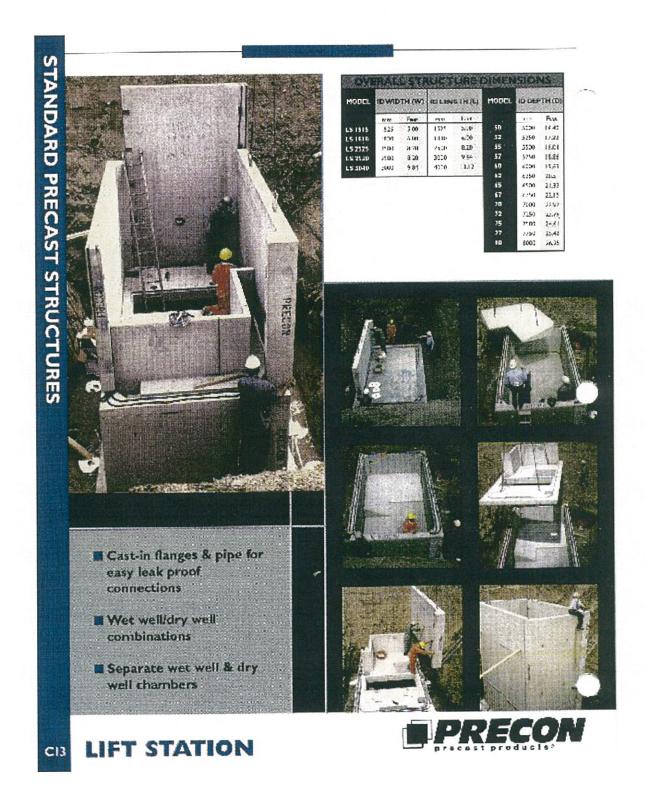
#### PHOTO EXAMPLES OF WATER SYSTEM BUILDING
